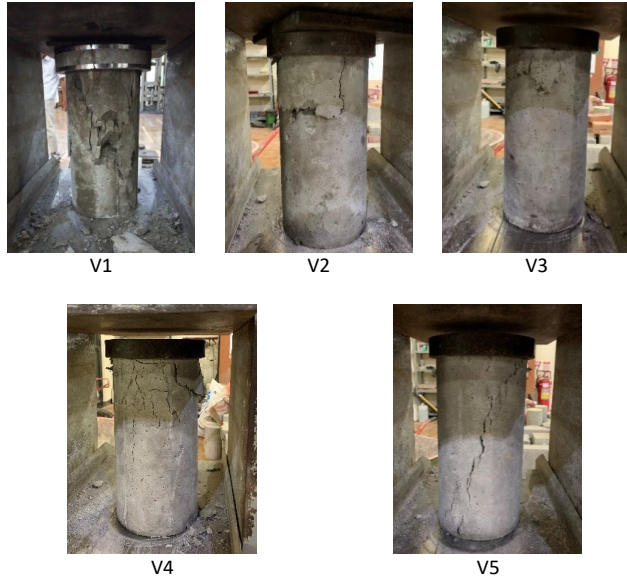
Crack and failure hybrid fiber-reinforced concrete (HFRC) at ages of 28 days for varied hybrid fiber addition under compression testing
